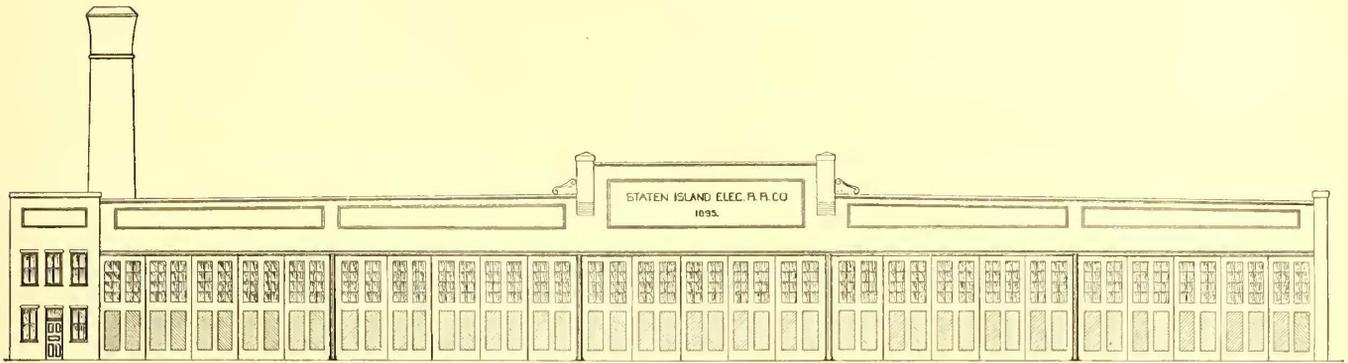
FRONT ELEVATION OF CAR HOUSE.
